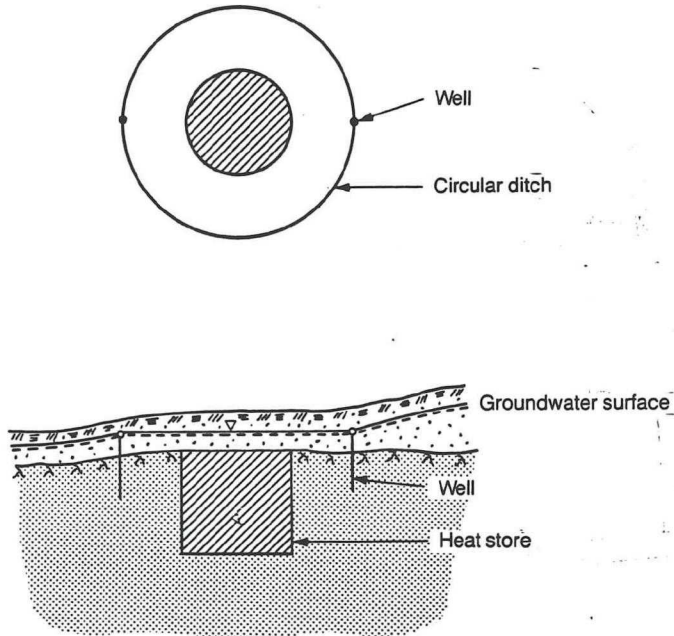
Plan and section of a heat store surrounded by a circular ditch.
